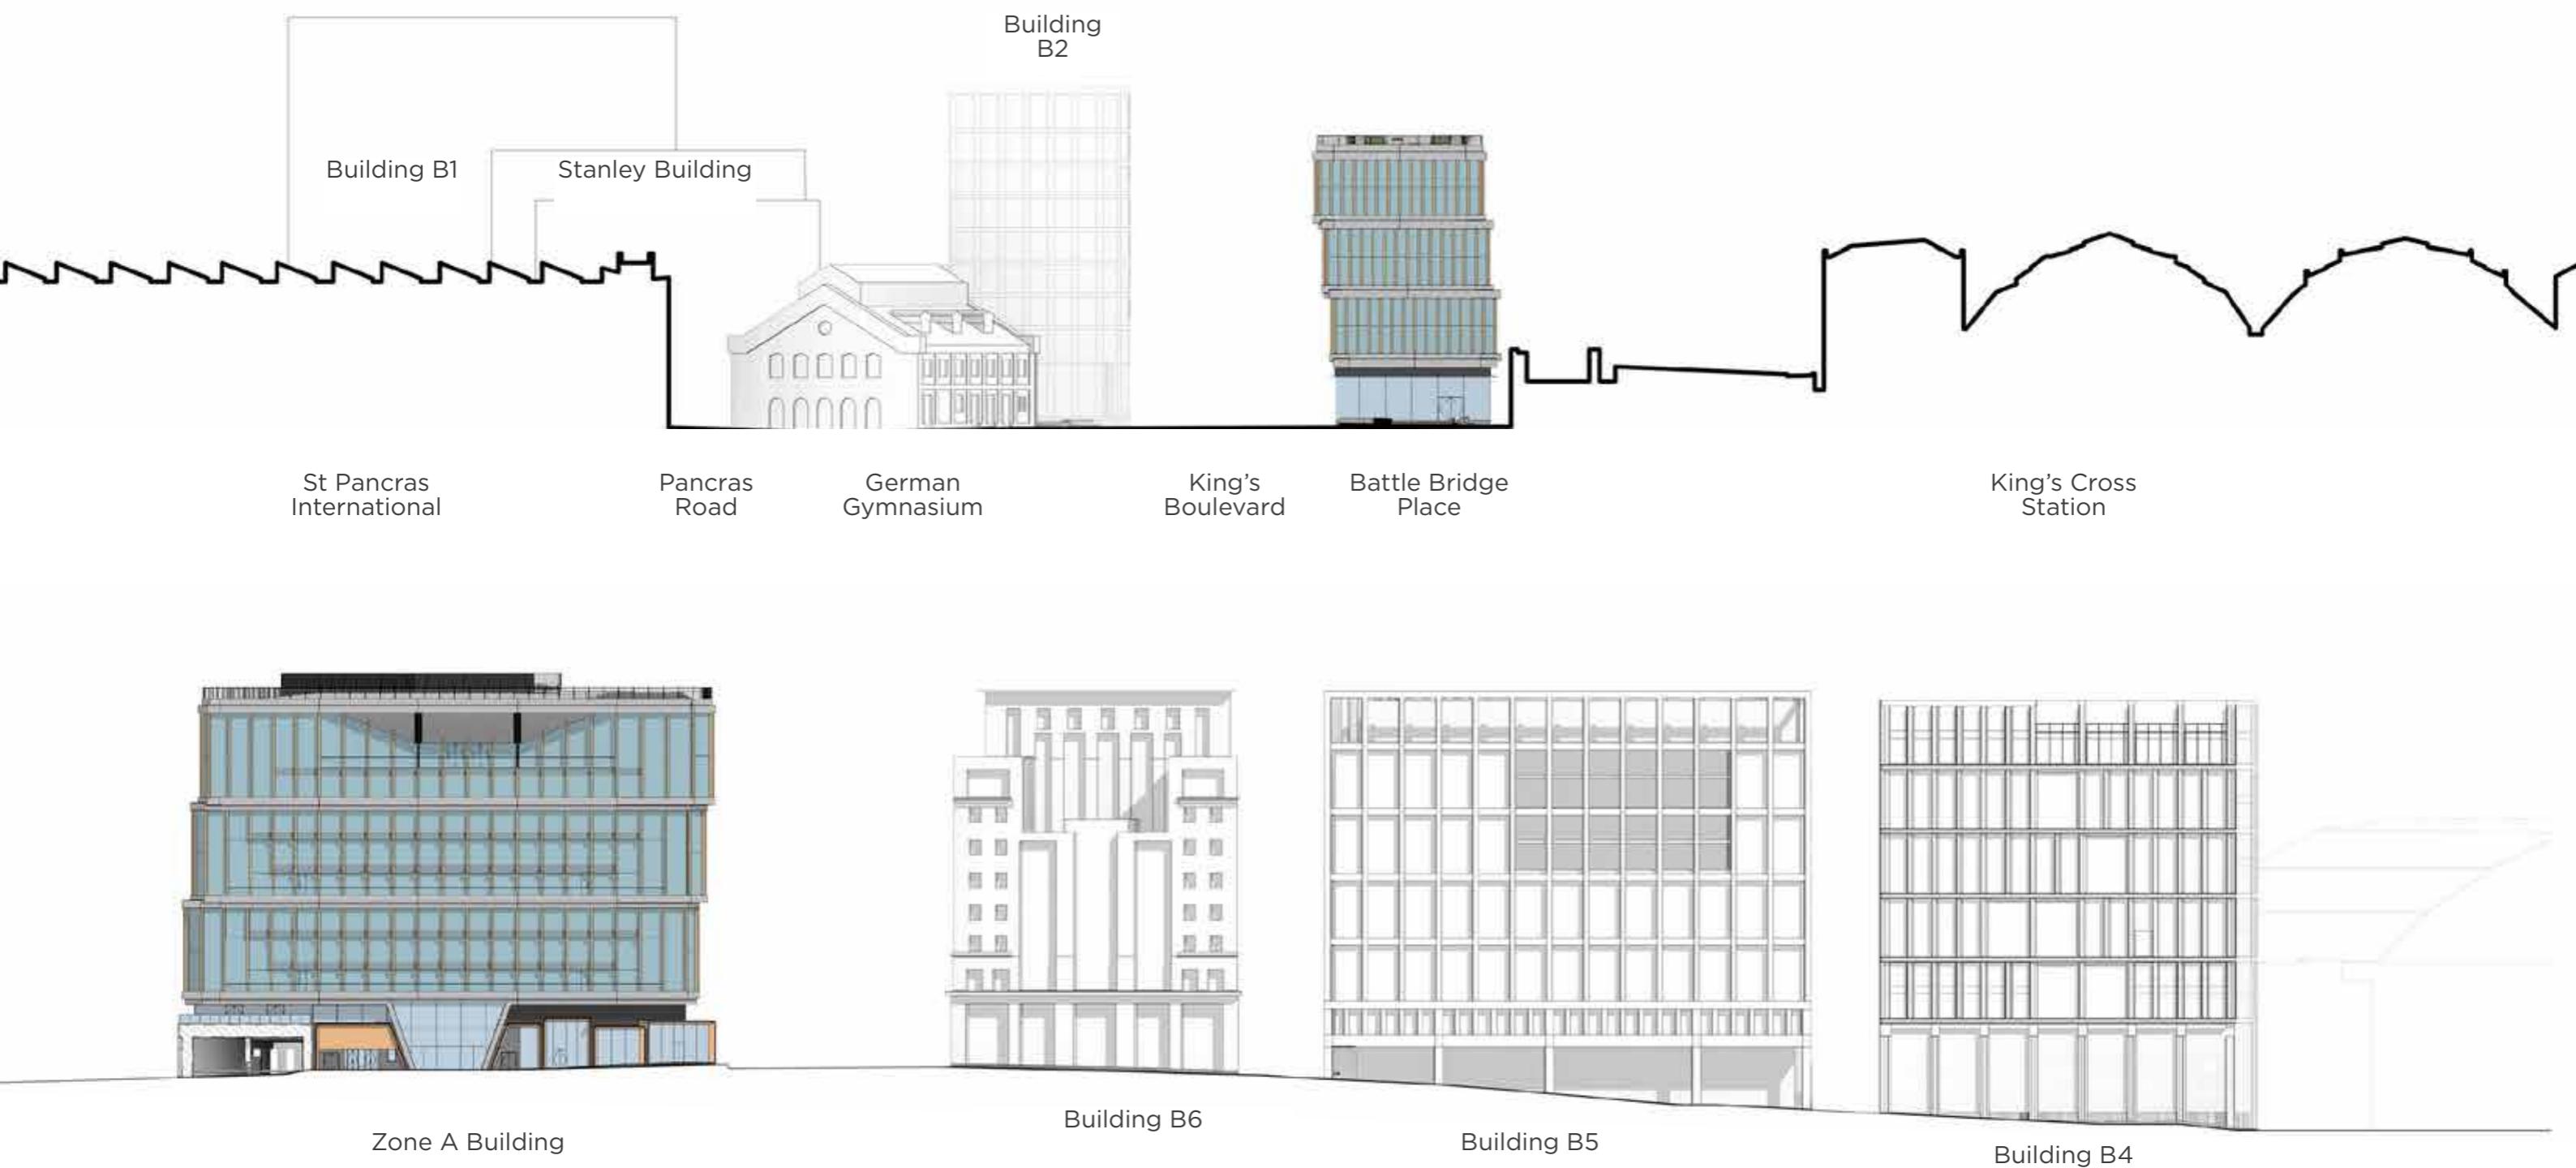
(top) south and (bottom) north elevations of the Zone A Building as seen within the context of its surrounding buildings
